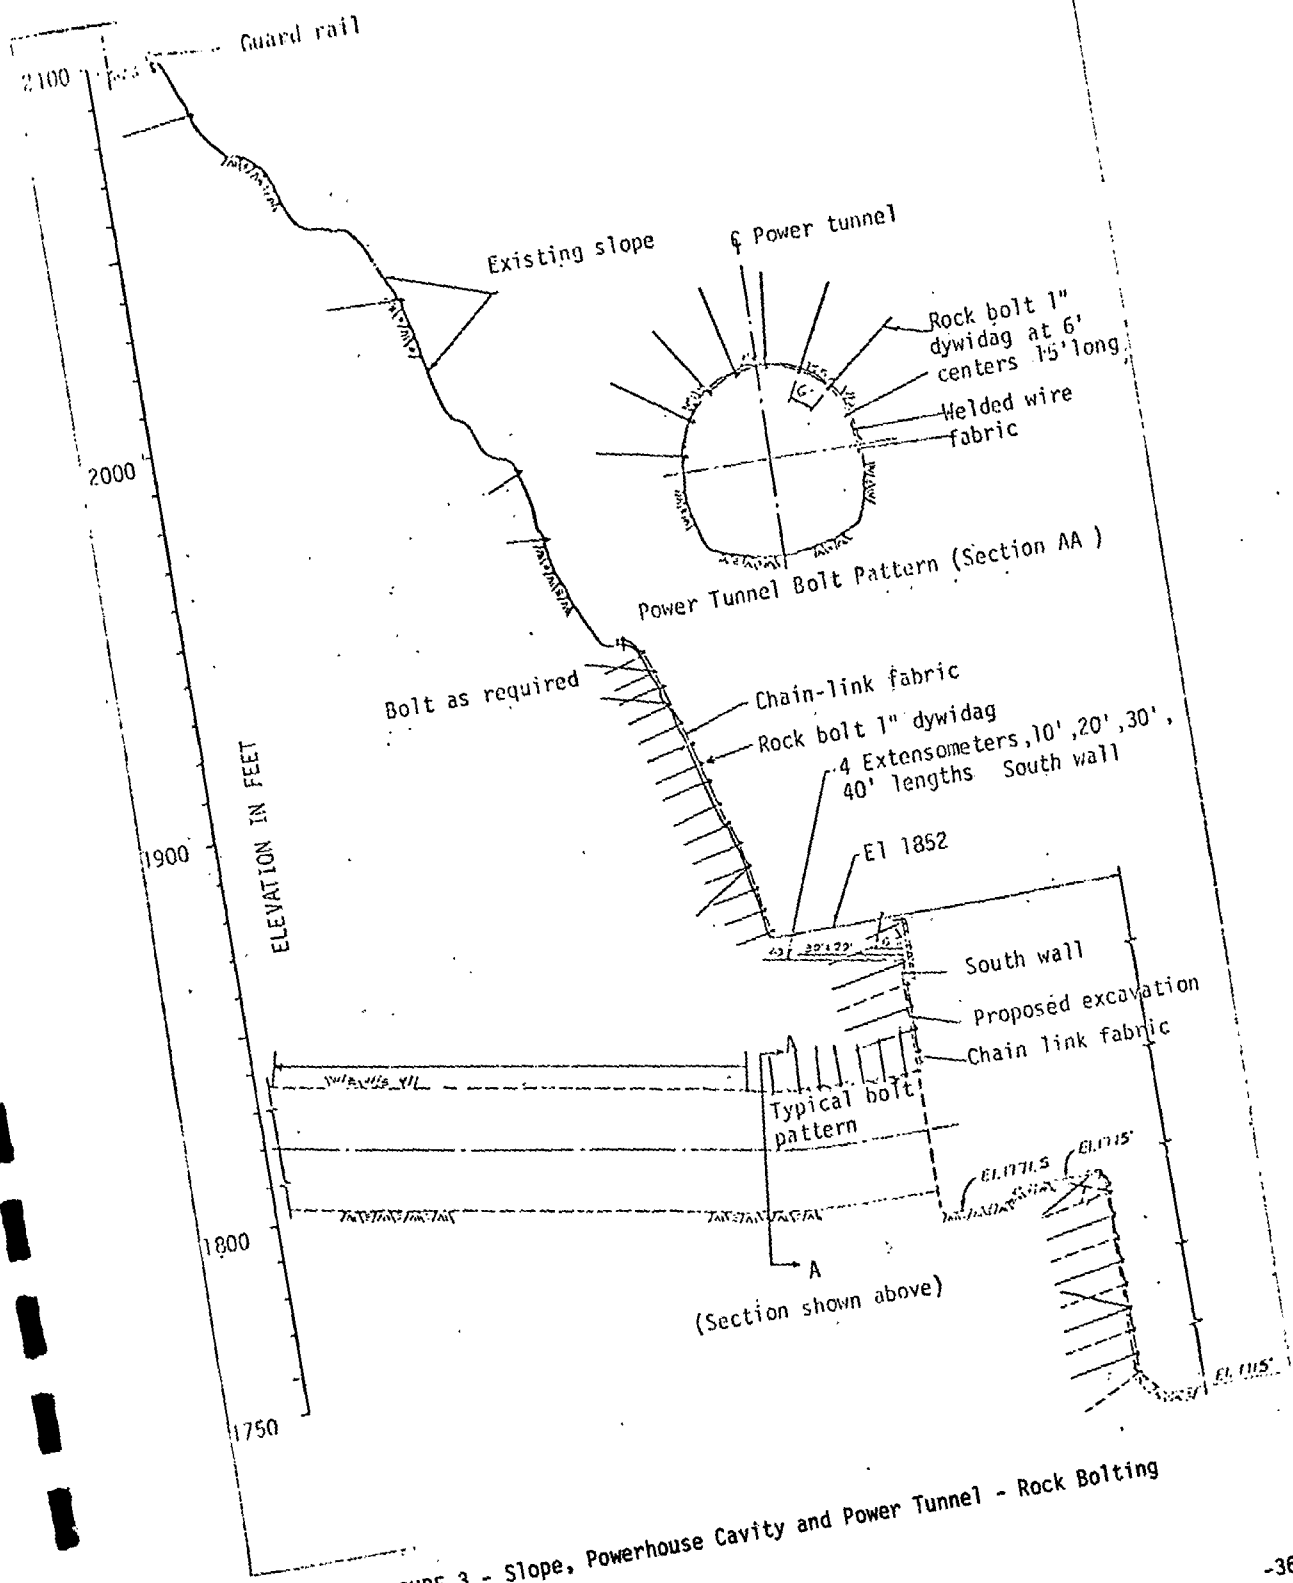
Slope, Powerhouse Cavity and Power Tunnel - Rock Bolting
